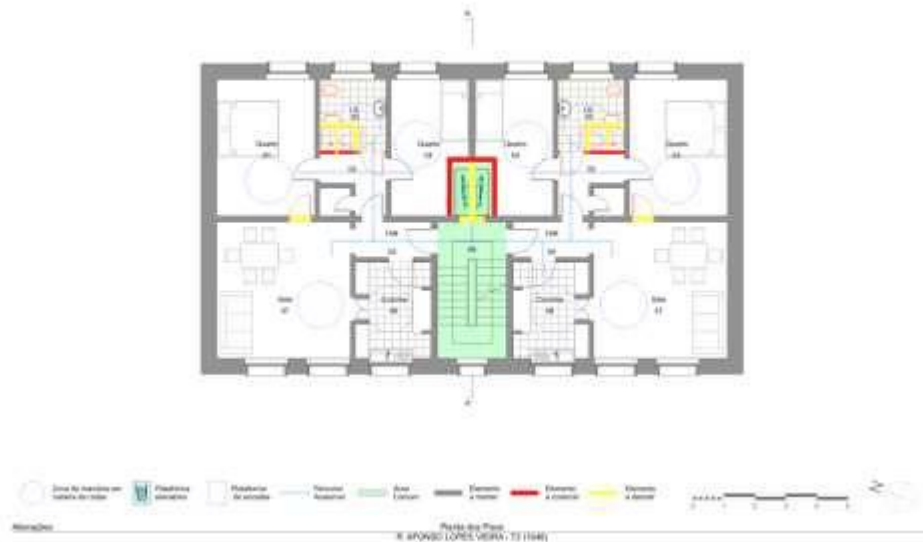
T2 Building as Assisted Housing — typical floor plan — Proposal. (Source: Carvalho, 2013)
